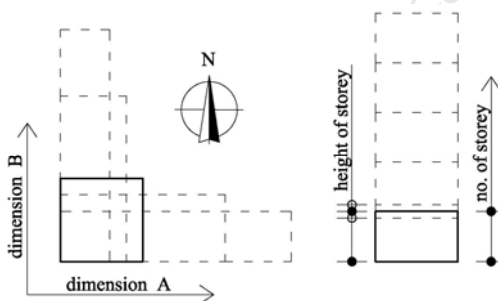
Rectangular shape of typical apartment buildings considered in the calculation, left: floor plan, right: section
